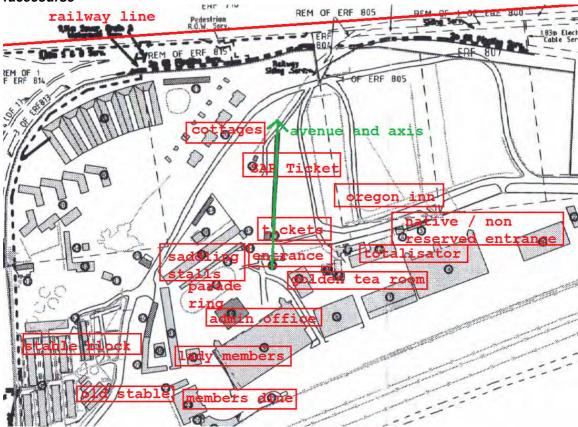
Detailed plan showing avenue and axis, and significant buildings discussed in this report
